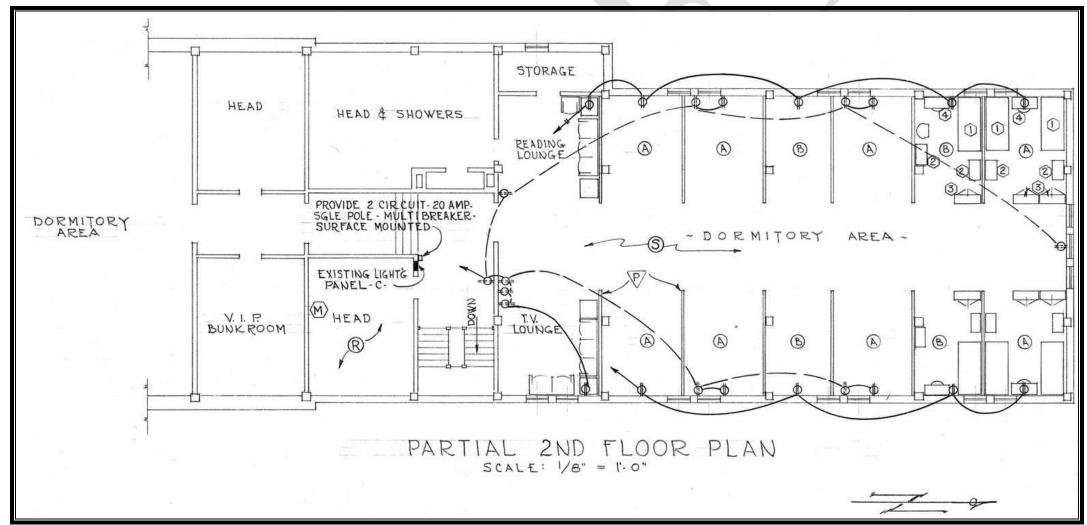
Building G, 1960 renovations (Courtesy Naval Air Station North Island)
